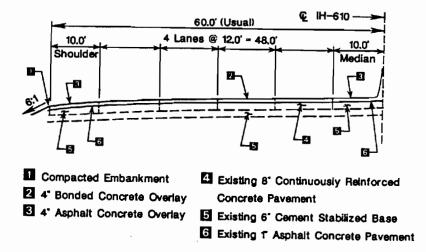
A typical cross section of the bonded concrete overlay pavement on IH 610 North, Houston.
